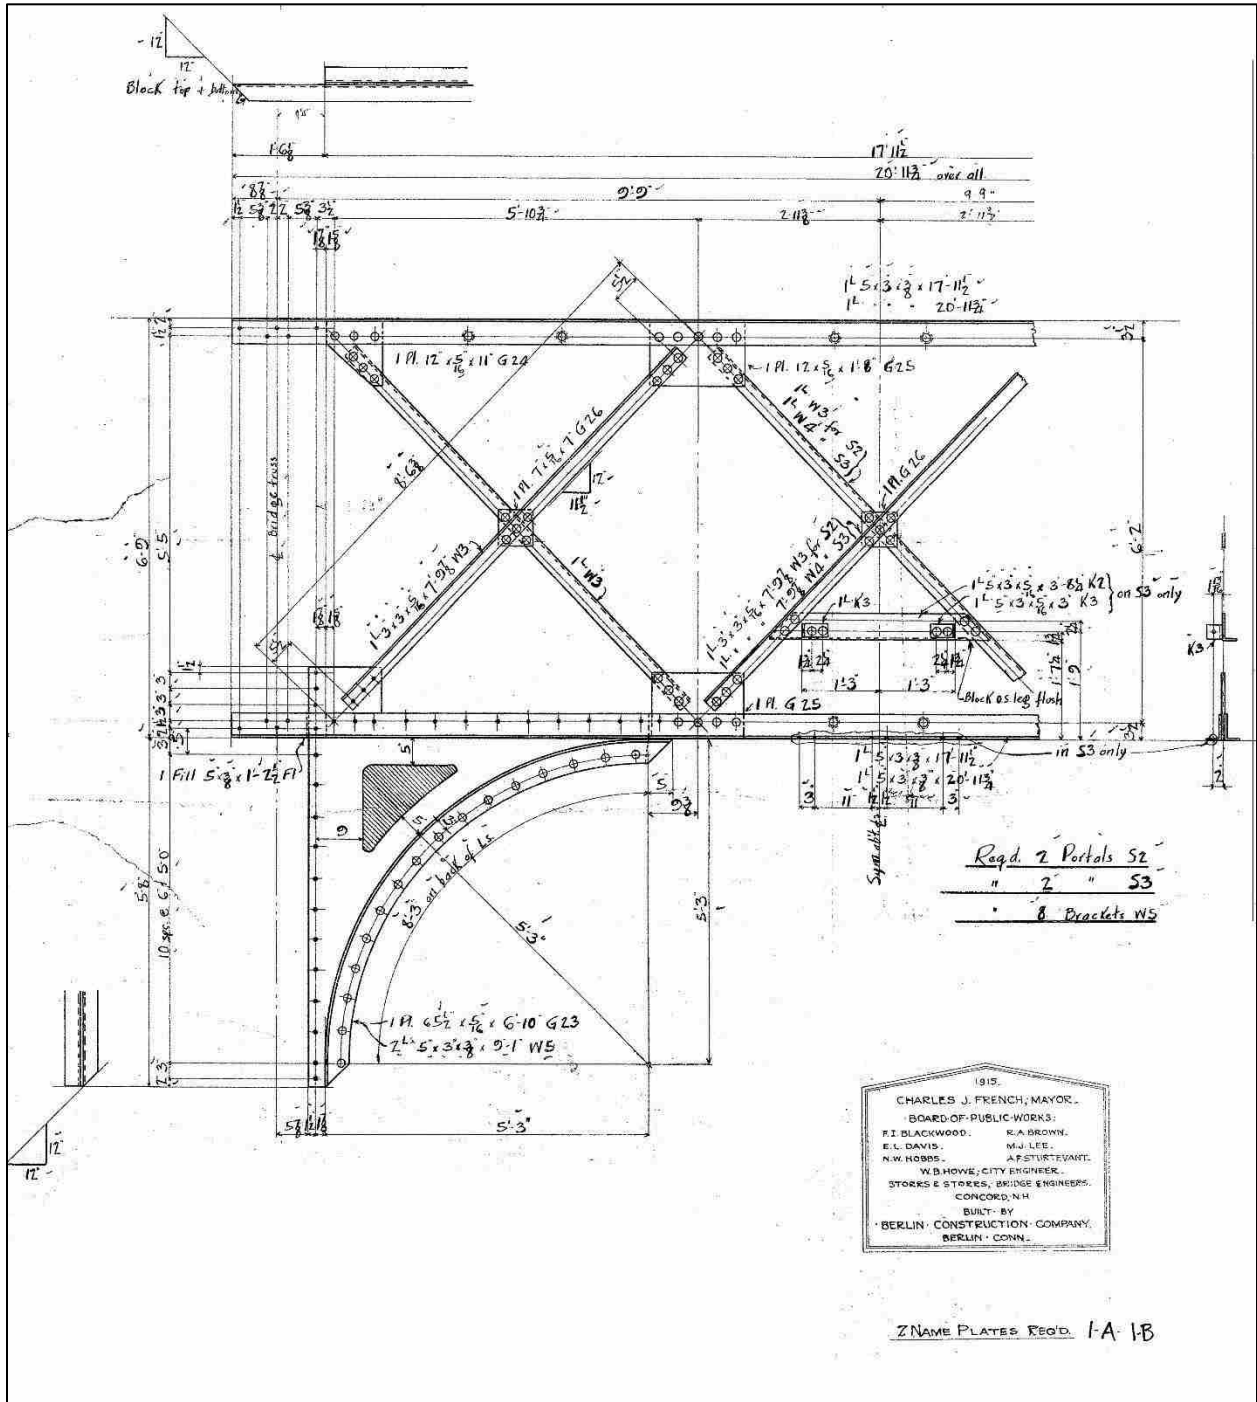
Sewall's Falls Bridge, portal framing and name plate details. Clip from Berlin Construction Company plan sheet 3 of 4, dated April 22, 1915. See attached documentation Drawing 4 (NHDOT Bureau of Bridge Design).
